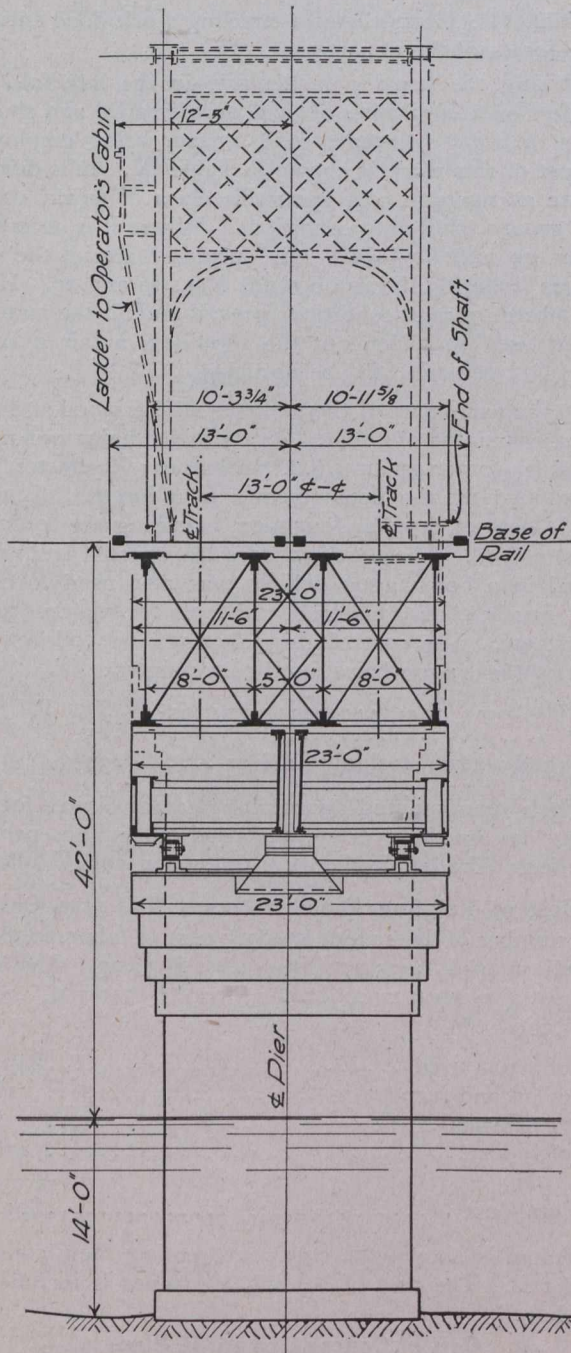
Sectional Elevation of New Bridge and Its Relation as Regards Height to Old Structure.
